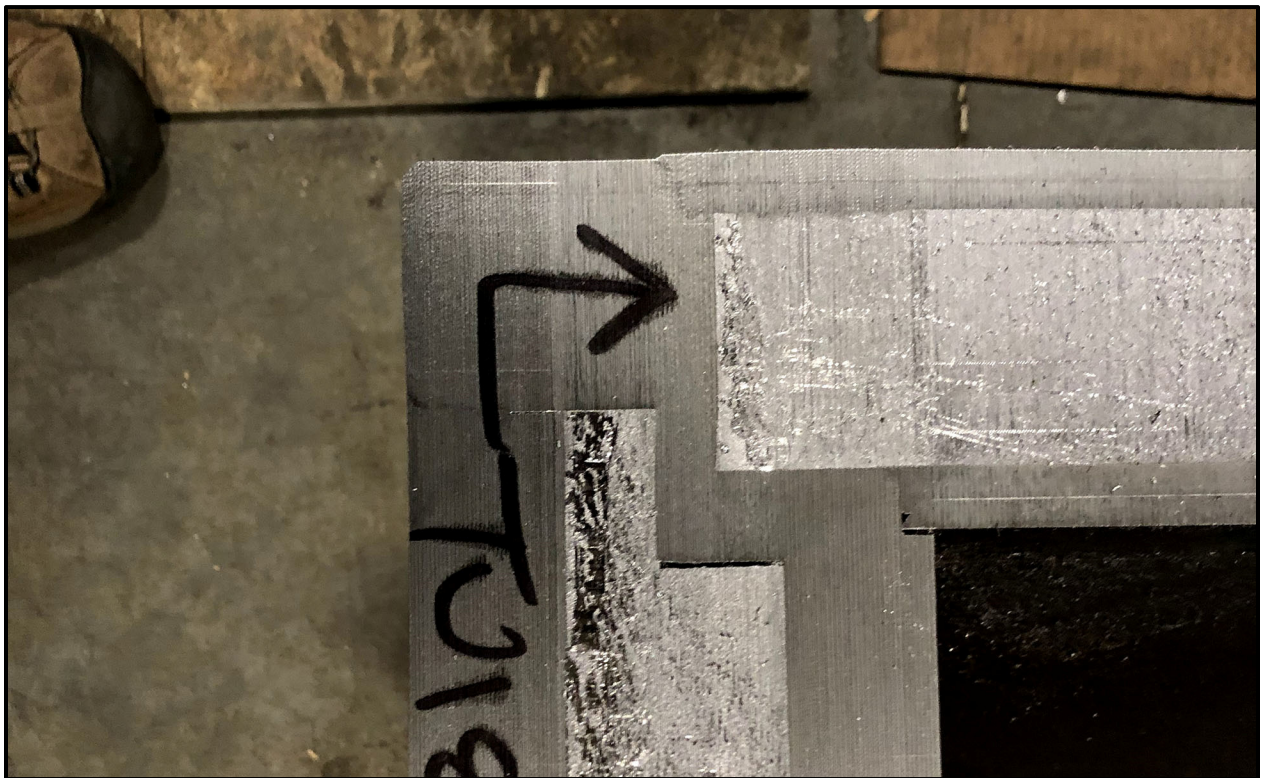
SC-55G2 18TU-09 Destructive Disassembly Cut A at Lower Flange
